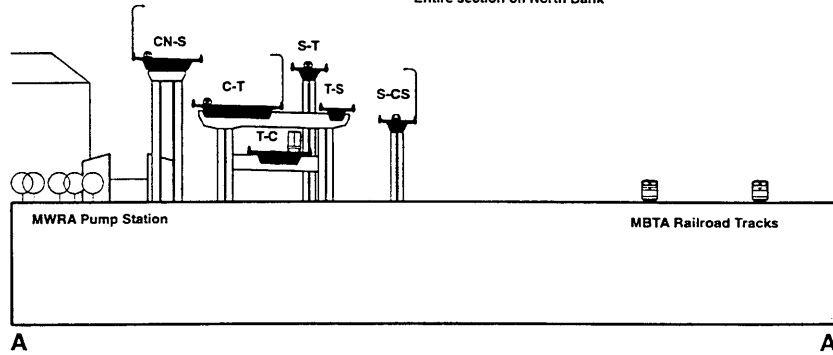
Comparisons of Sections of Loop Ramps in North Point
